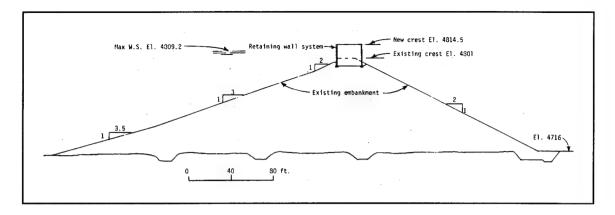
Retaining wall method of raising dam crest elevation, Lake Sherburne Dam
